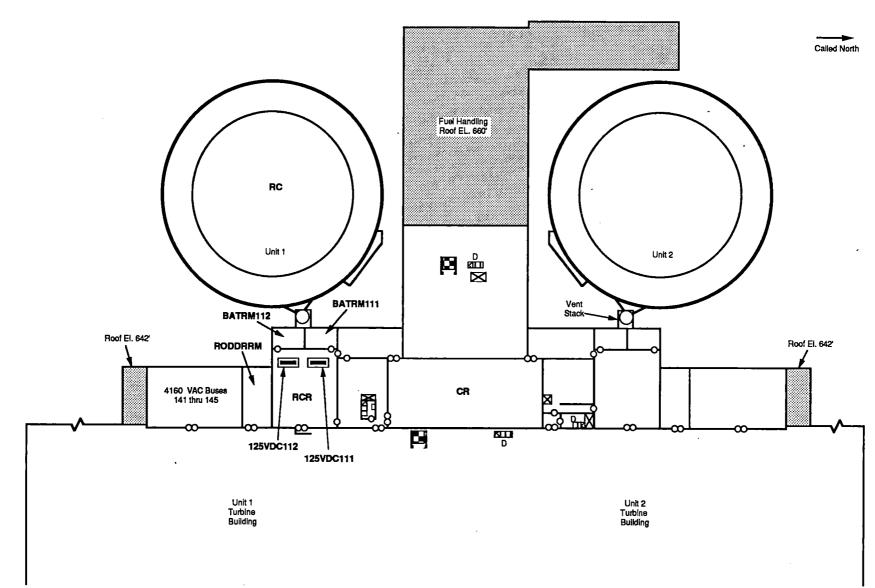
Zion 1 and 2 General Arrangement, Elevation 642'
